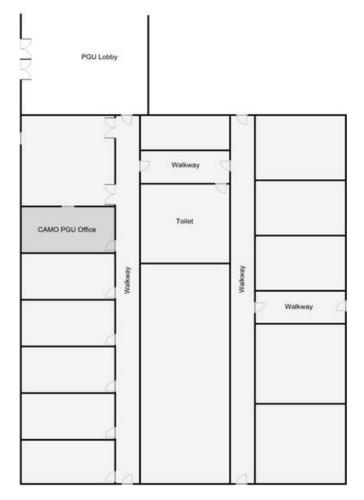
Facility Layout (GAM CAMO PGU Office – Ground Floor)
